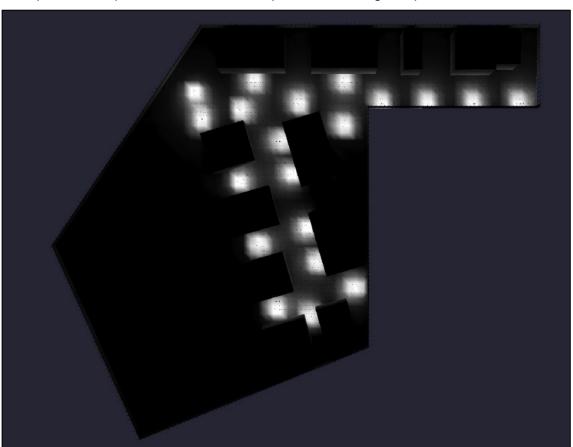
Outdoor Lighting Plan – Render demonstrating compliance with the Outdoor lighting code
